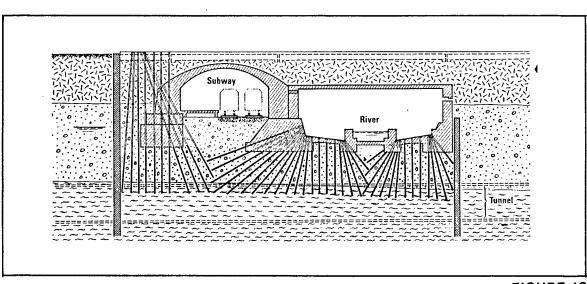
show some of the actual projects where grouting was used under various conditions and for various applications in underground construction.
